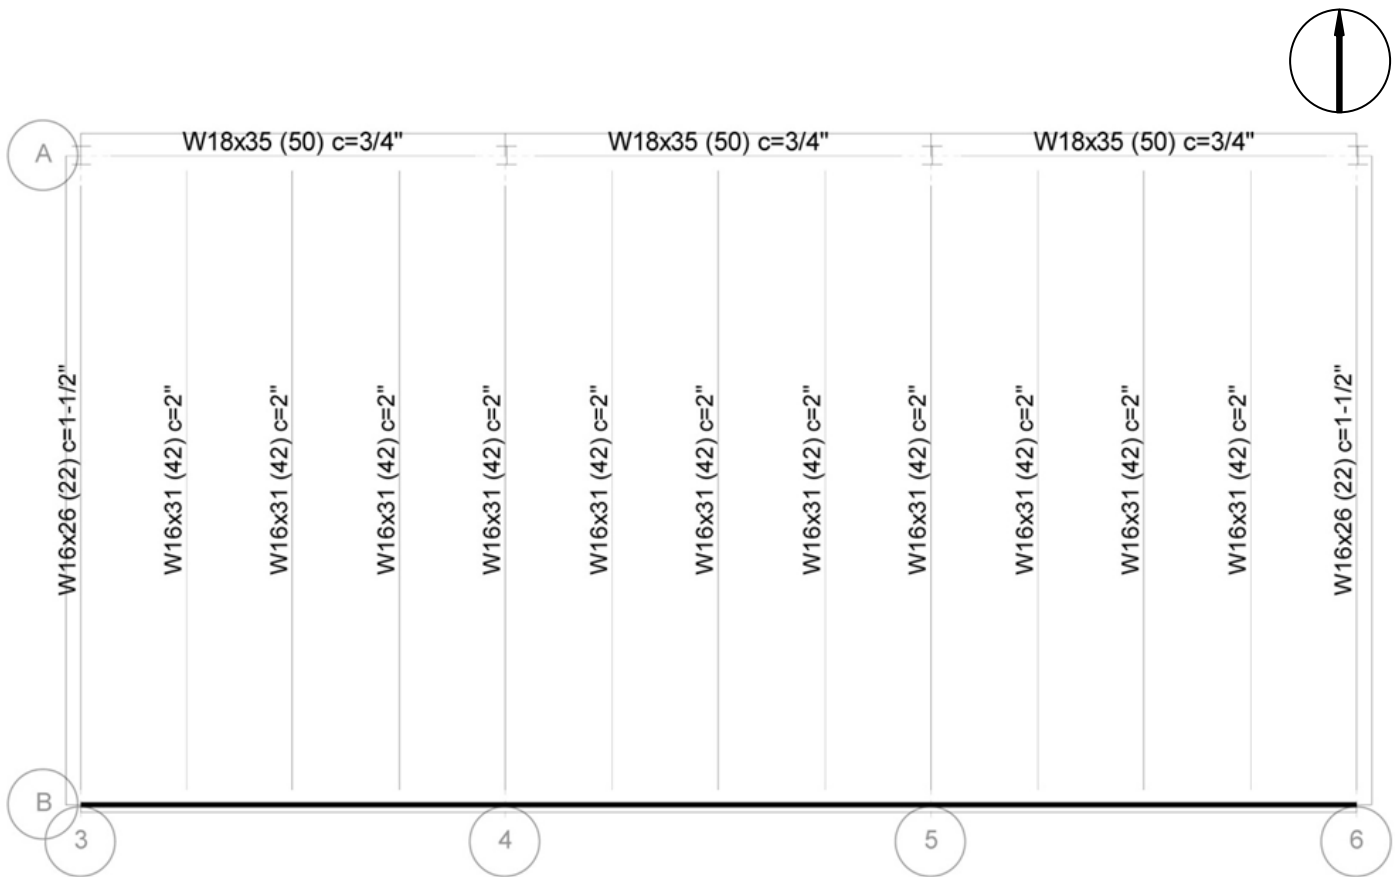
RAM designed members for existing system and ASCE 7-05 design loads.
